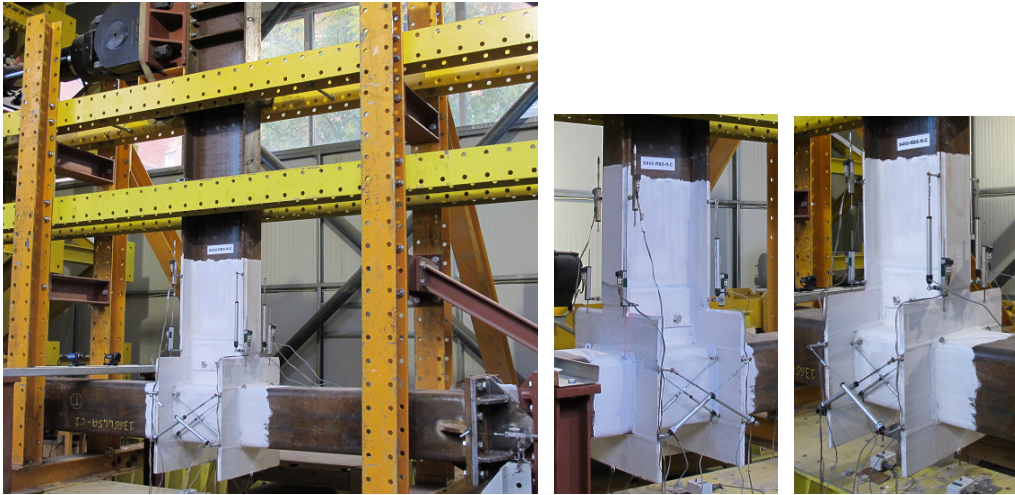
S460-RBS-R test assembly and connection zone – before test
